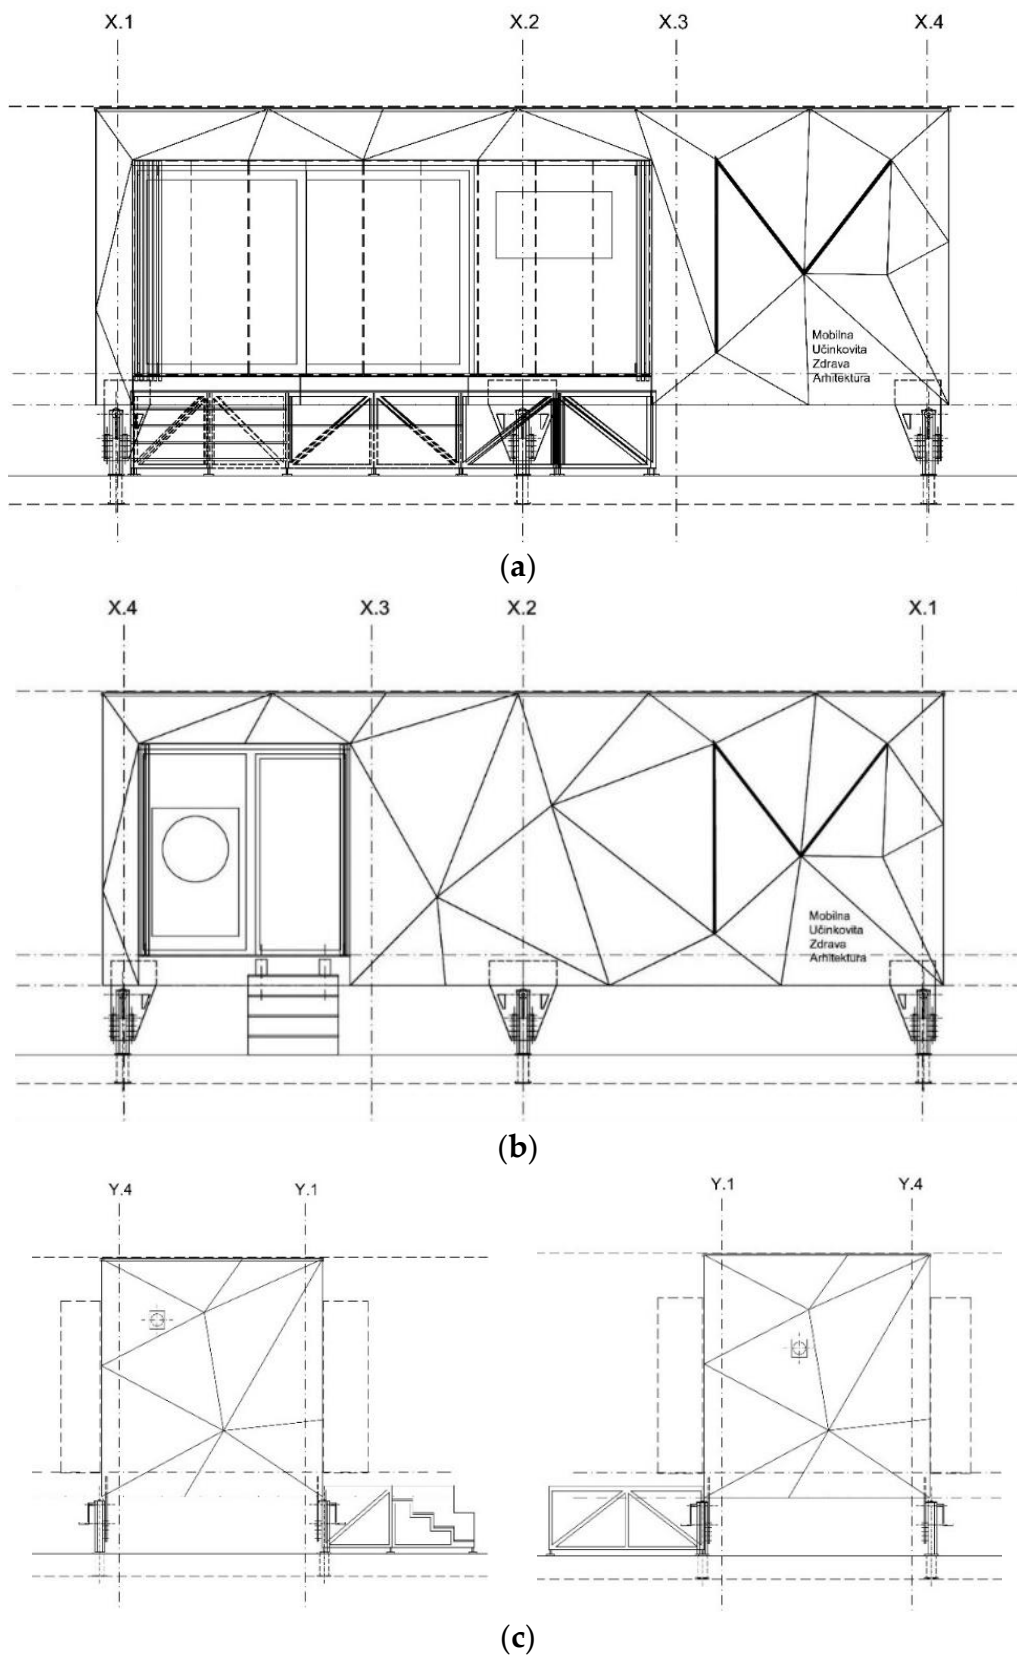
Exterior views of the MUZA pavilion: (a) main façade, (b) back façade, (c) side façades.
